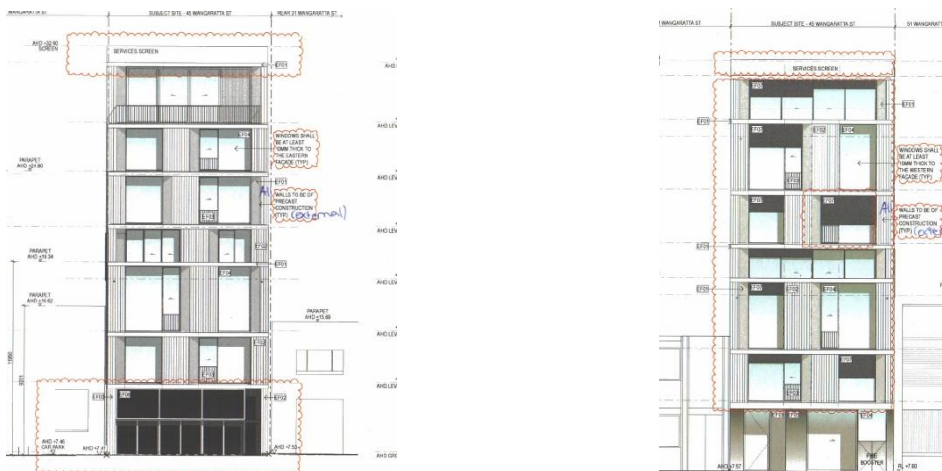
Wangaratta St and Botherambo St elevation of development under construction pursuant to Planning Permit PLN15/1260.
